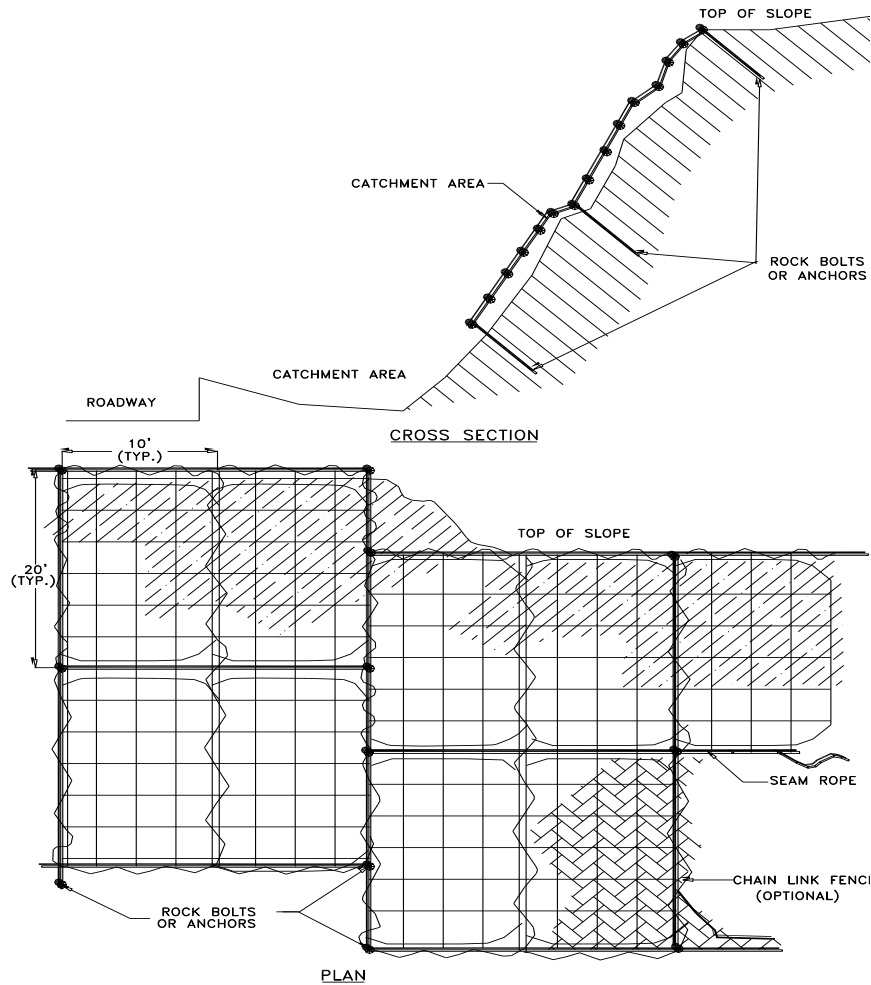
STEEL WIREMESH PROTECTION ON CUT SLOPE
